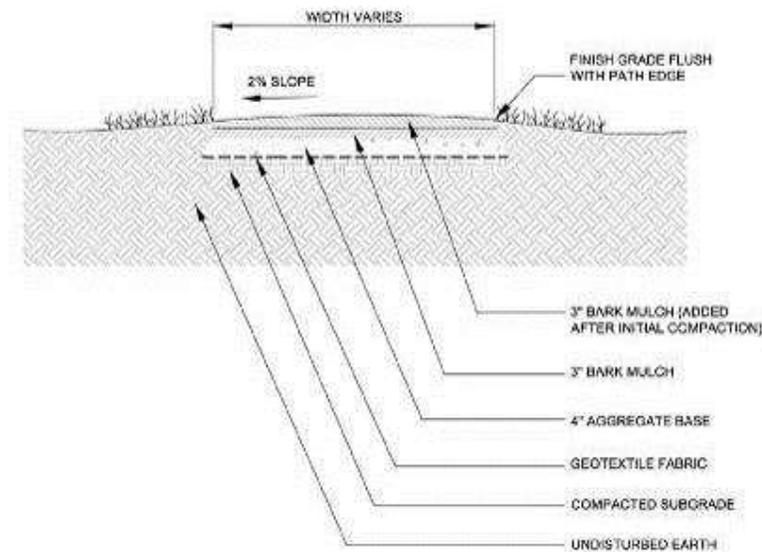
Bark Mulch or Filbert Shell Cross-Section
